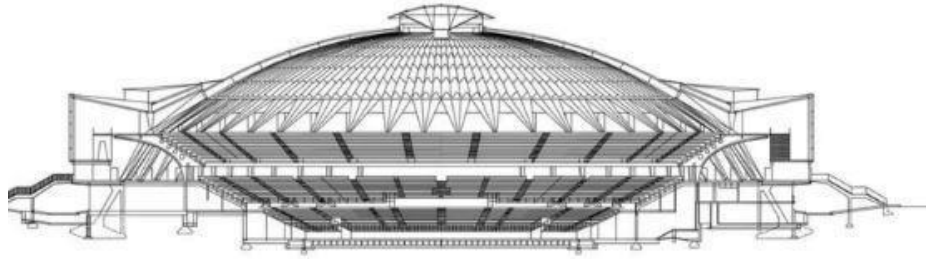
Section View of Palazetto Dello Sport (ArchDaily)
